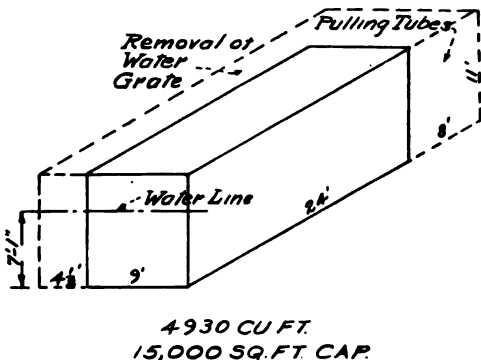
TYPICAL INSTALLATION OF SINGLE STEEL BOILER.
